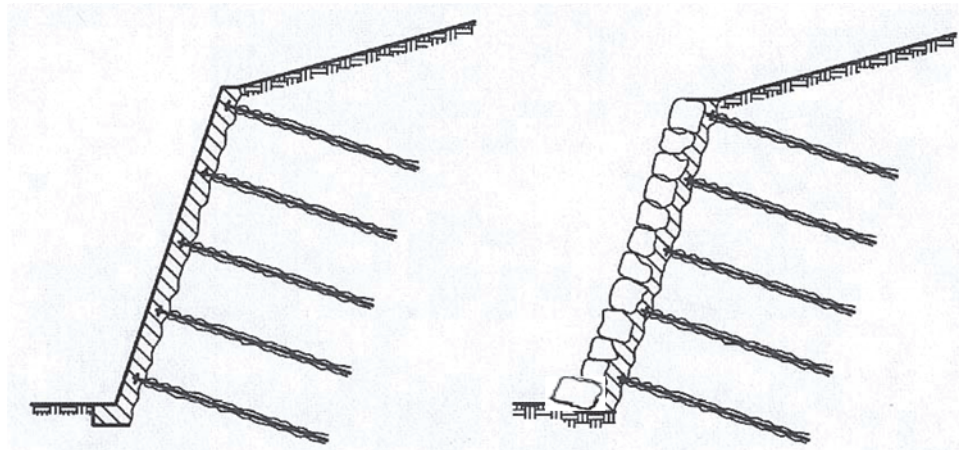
Constructed hard facing with concrete (either sprayed or placed or precast)
